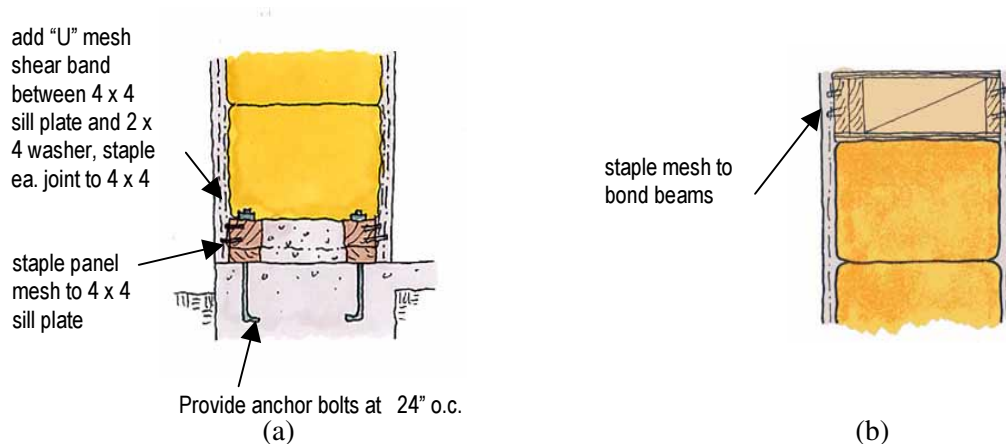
Recommended anchorage details (a) at the base of the wall and (b) at the top of the wall.
